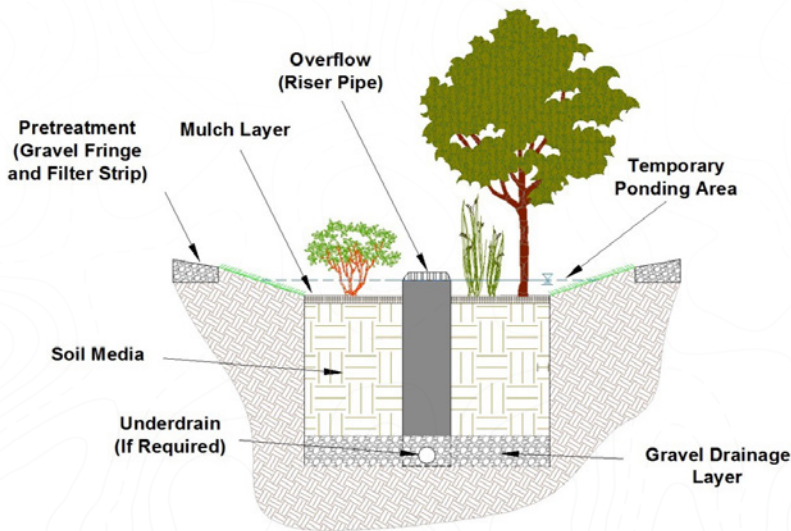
Online bioretention area with a vertical rise overflow with a variable flow outlet structure
